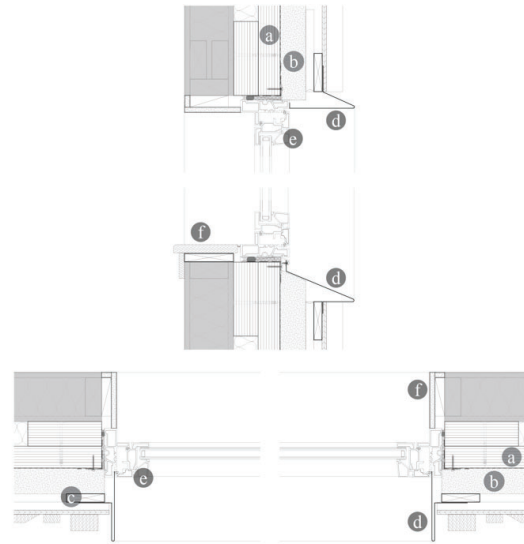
Detail section and plan views of façade retrofit at window: a) 51mm MPP panel; b) shop-applied mineral wool board; c) vertical batten; d) brake-form steel window enclosure; e) fiberglass window; f) new interior finish.
